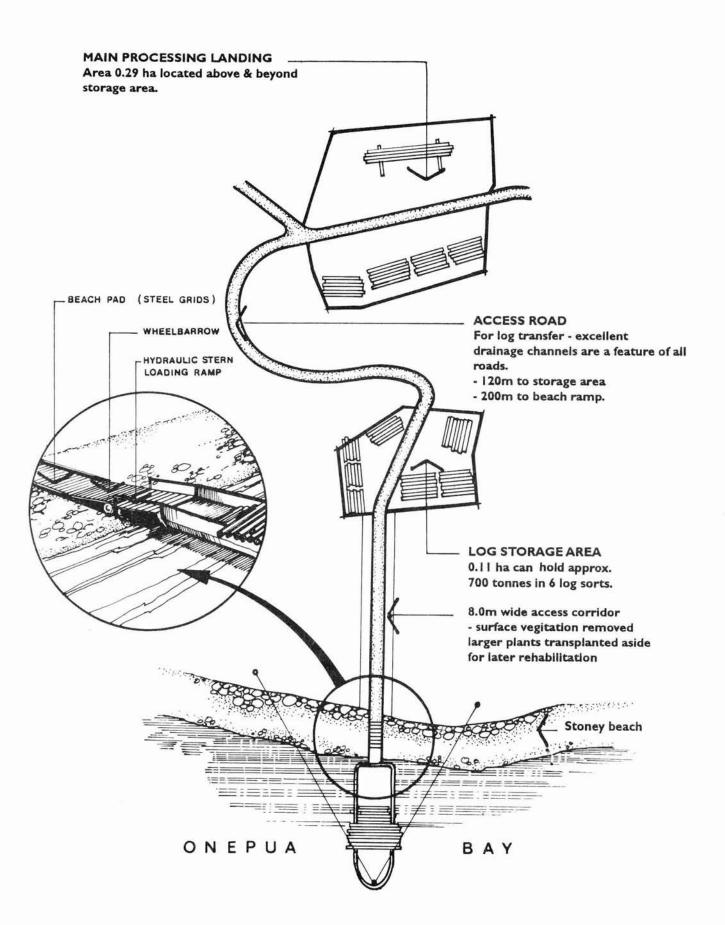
Layout of processing, storage and loading areas - Onepua Bay
